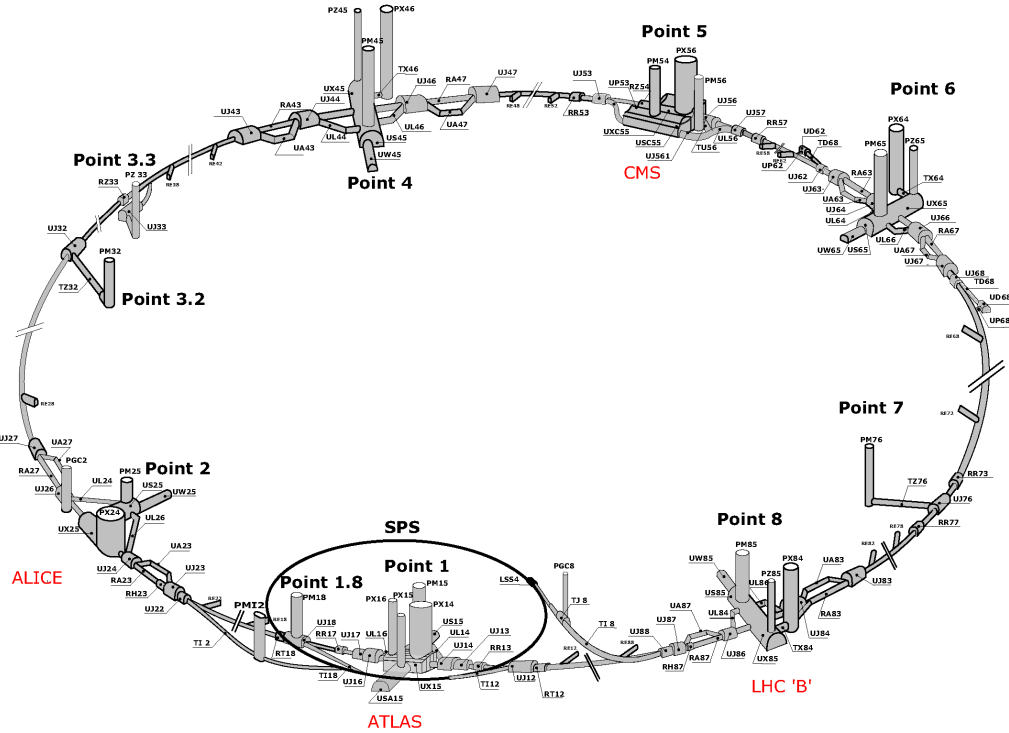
Schematic layout of the LHC underground facilities and access points [7].
